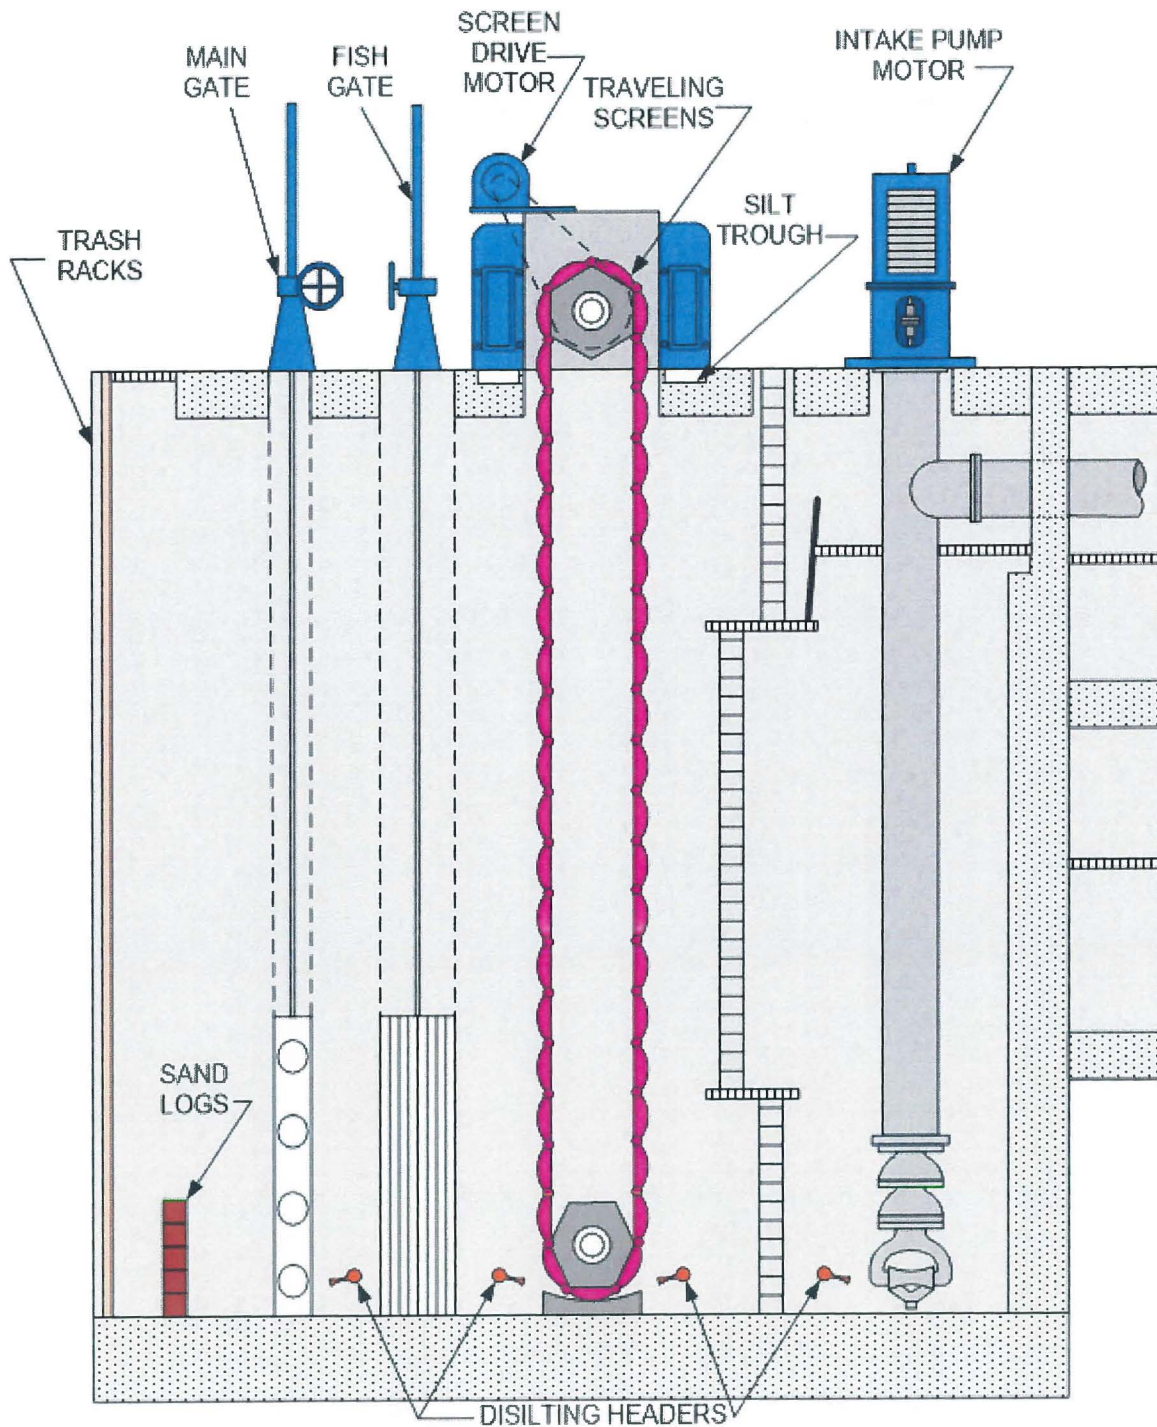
Callaway Energy Center MWIS Typical Elevation
